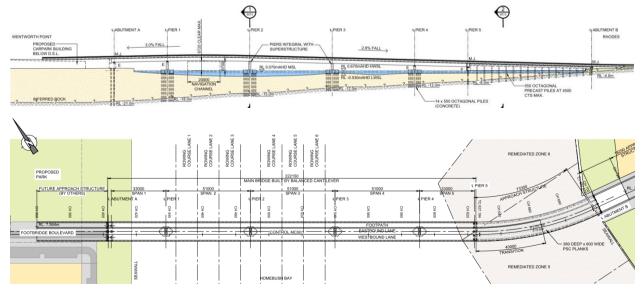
Plan and elevation of the proposed Homebush Bay bridge
